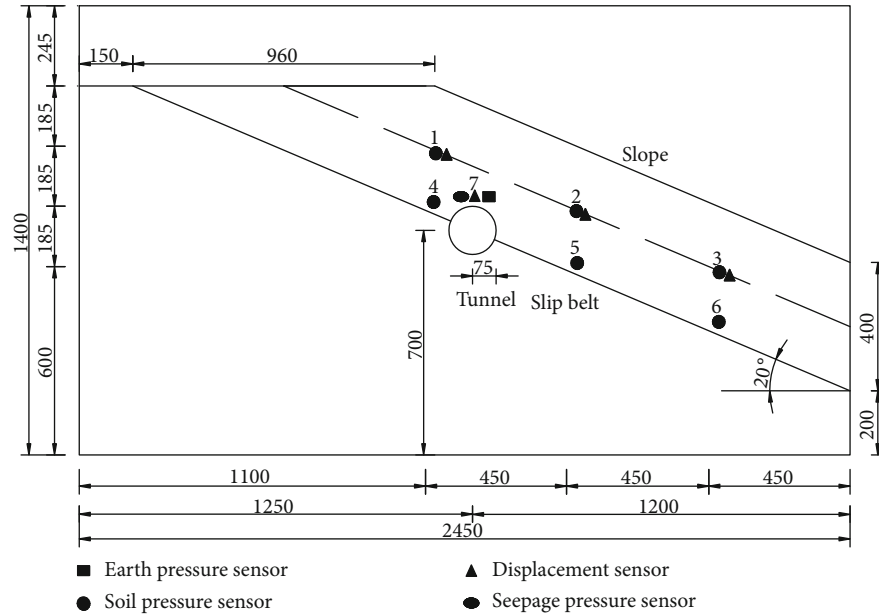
The section view of the tunnel-slope system model experiment (unit: mm).
